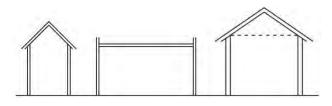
a. Representative cross-section of timber halls, first millennium BC to 11th century AD; b. Cross-section of Horn's reconstruction of the refectory on the St. Gall Plan, as in fig. 9 above; c. Cross section of the refectory of Norwich Cathedral priory, c. 1100.
